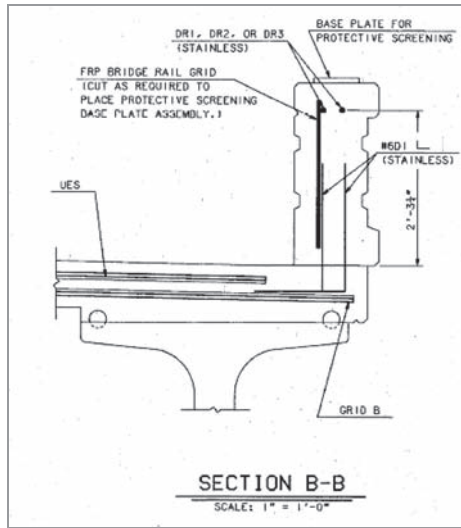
Section view of bridge rail connection to bridge deck (NHDOT Bureau of Bridge Design, 1999).
